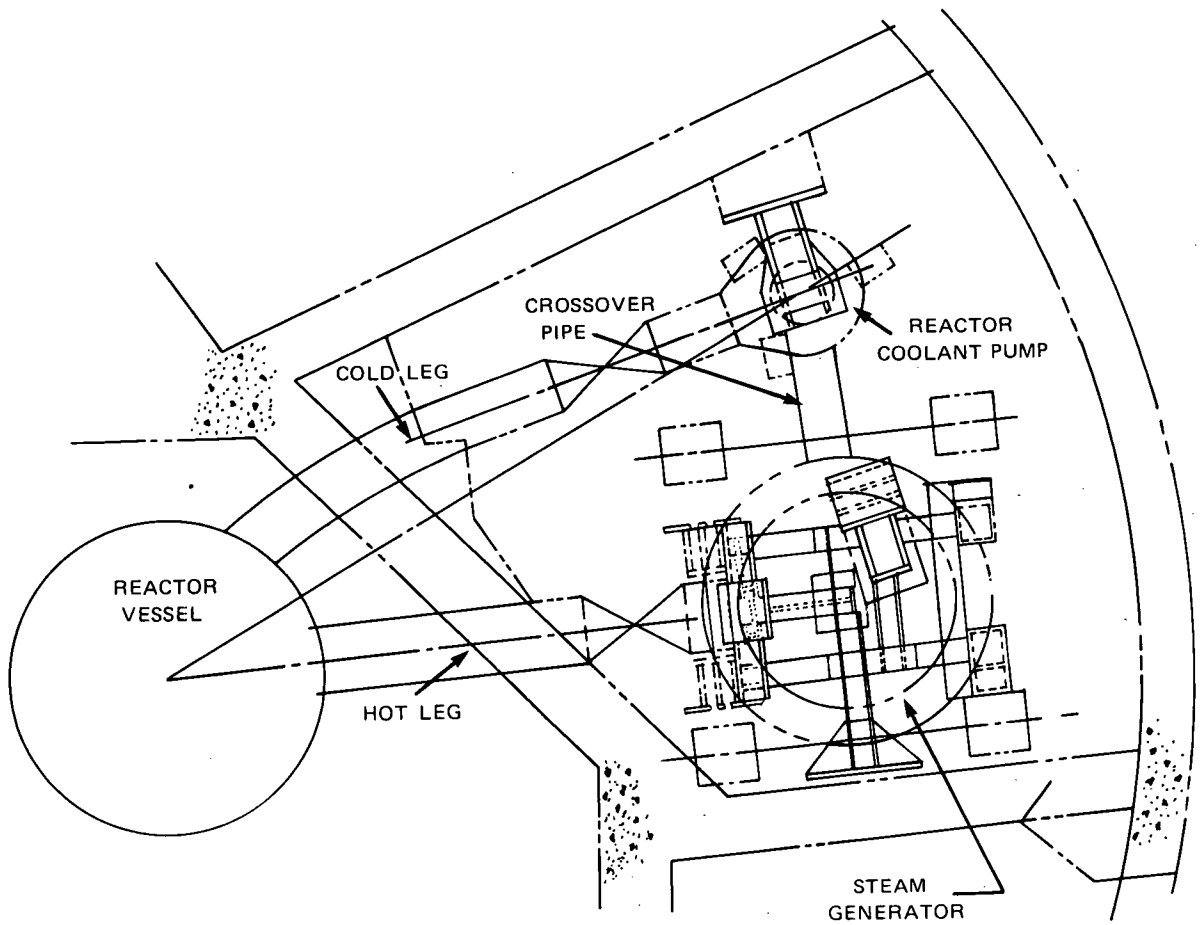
Plan View - Cubicle Loop (Typical)
